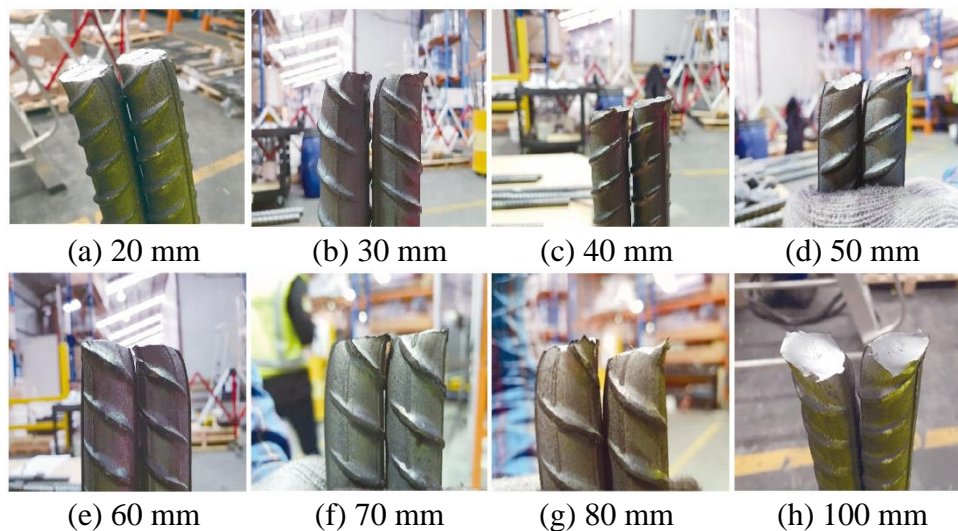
Rockbolt surfaces after failures for AUS R27.
